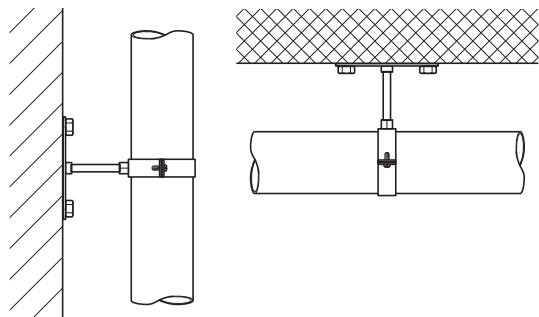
Vertical and horizontal fastening of sliding points with a pipe bracket on the pipe
